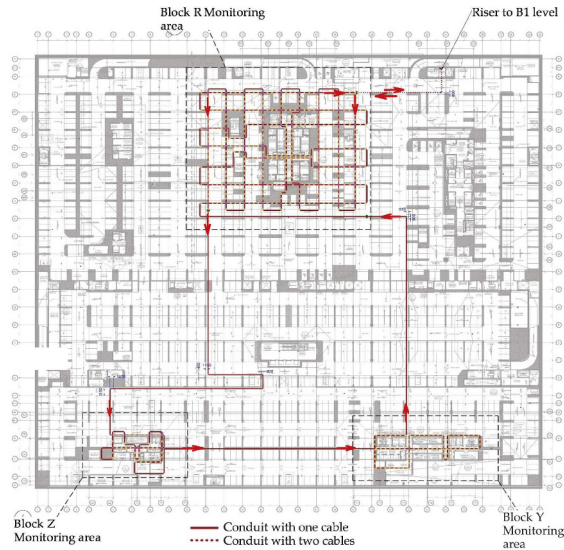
Part plan of cable routing in block R monitoring area on B4 raft.
